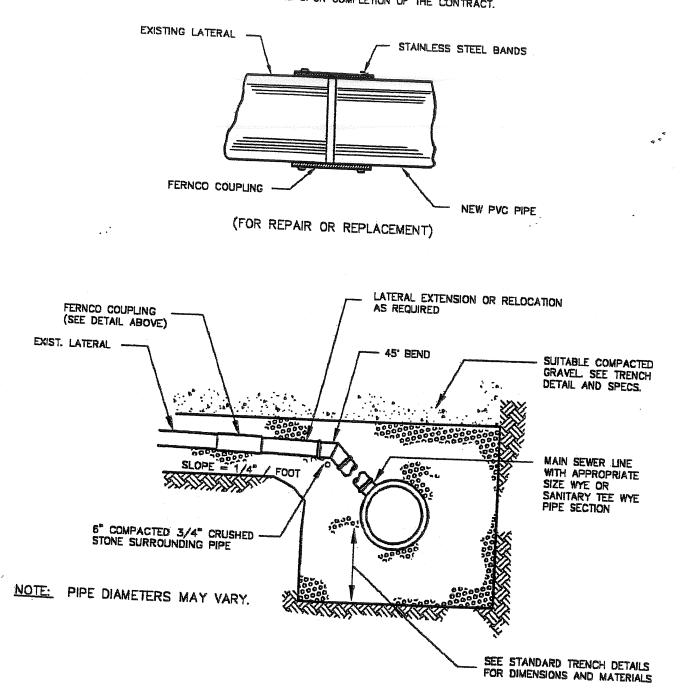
TYPICAL EXISTING LATERAL CONNECTION DETAIL
